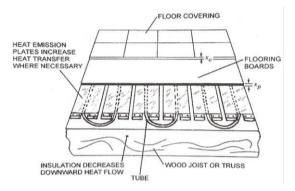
TYPE G system with pipes built in wooden construction (2, 3)
